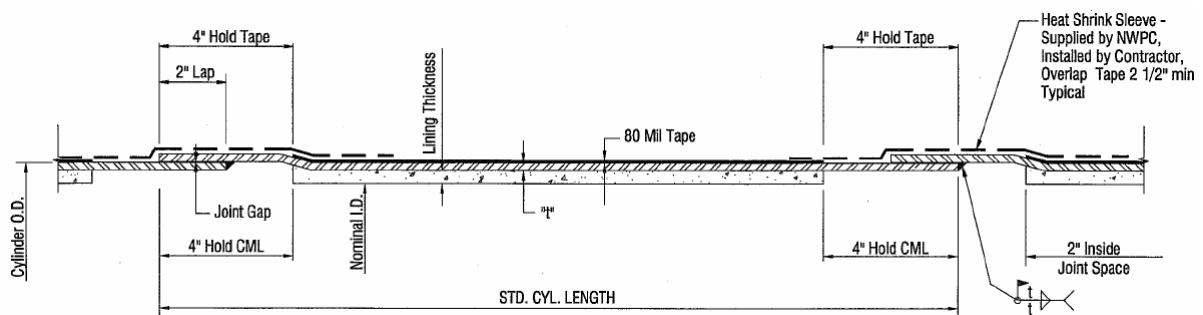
Cut-through schematic of a typical tape-coated and cement mortar-lined (CML) steel pipe section.
